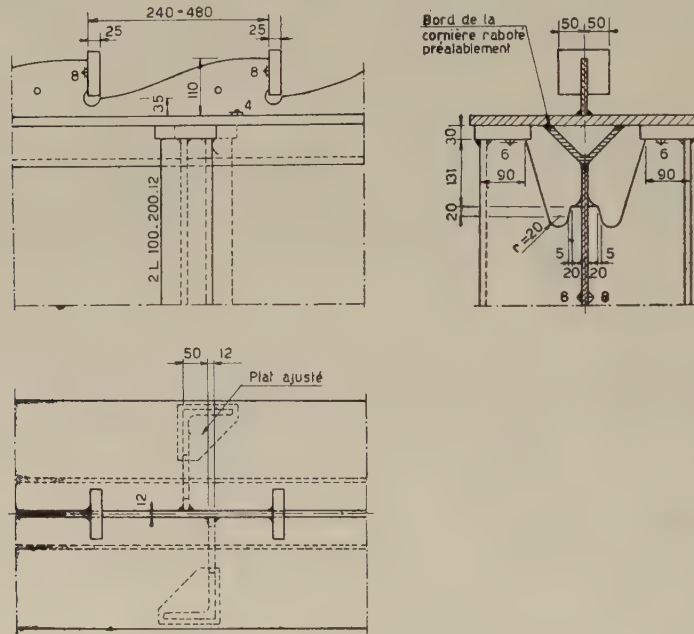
Details of construction of the upper girder with pin tooth rack.
